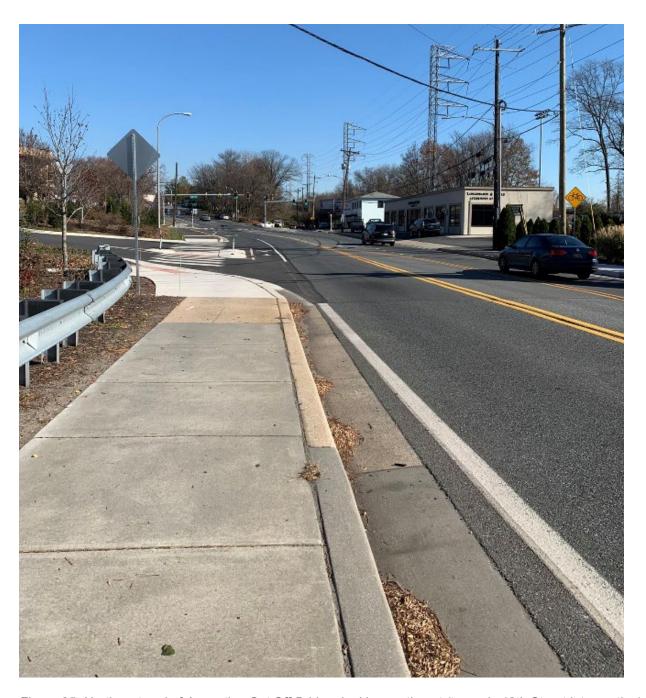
Northeast end of Augustine Cut Off Bridge, looking northeast (towards 18th Street intersection)
